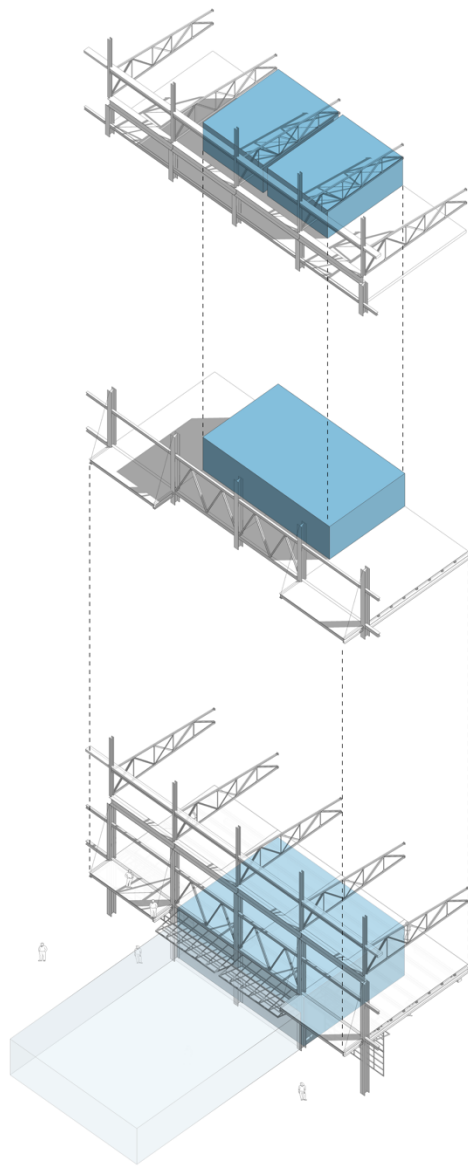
, Workshops, Classrooms, and Meeting Rooms (Source: Author)
